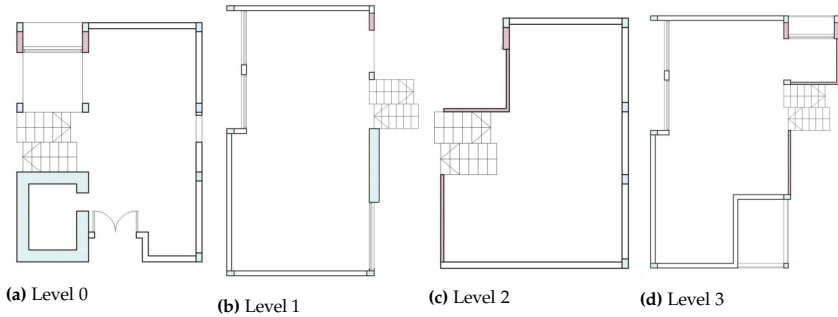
Provided empty building envelope plans (Experiment 14)
